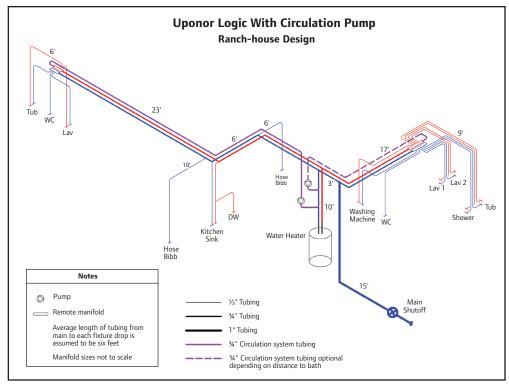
Uponor Logic for a Typical Ranch-house Plan
